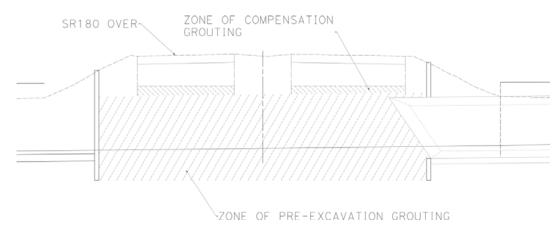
Zones Where Pre-Excavation Ground Treatment and Compensation Grouting May Be Used
